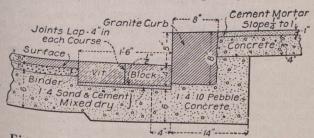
Granite Curb and Vitrified Brick Gutter.
